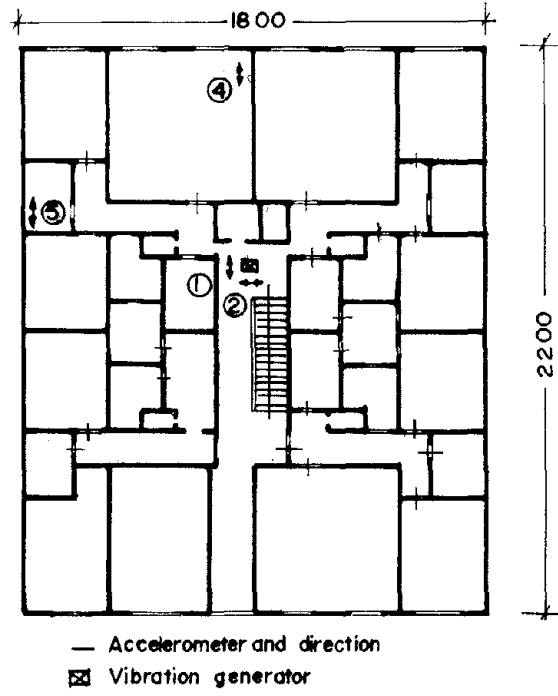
FLOOR PLAN AND INSTRUMENT LOCATIONS.
